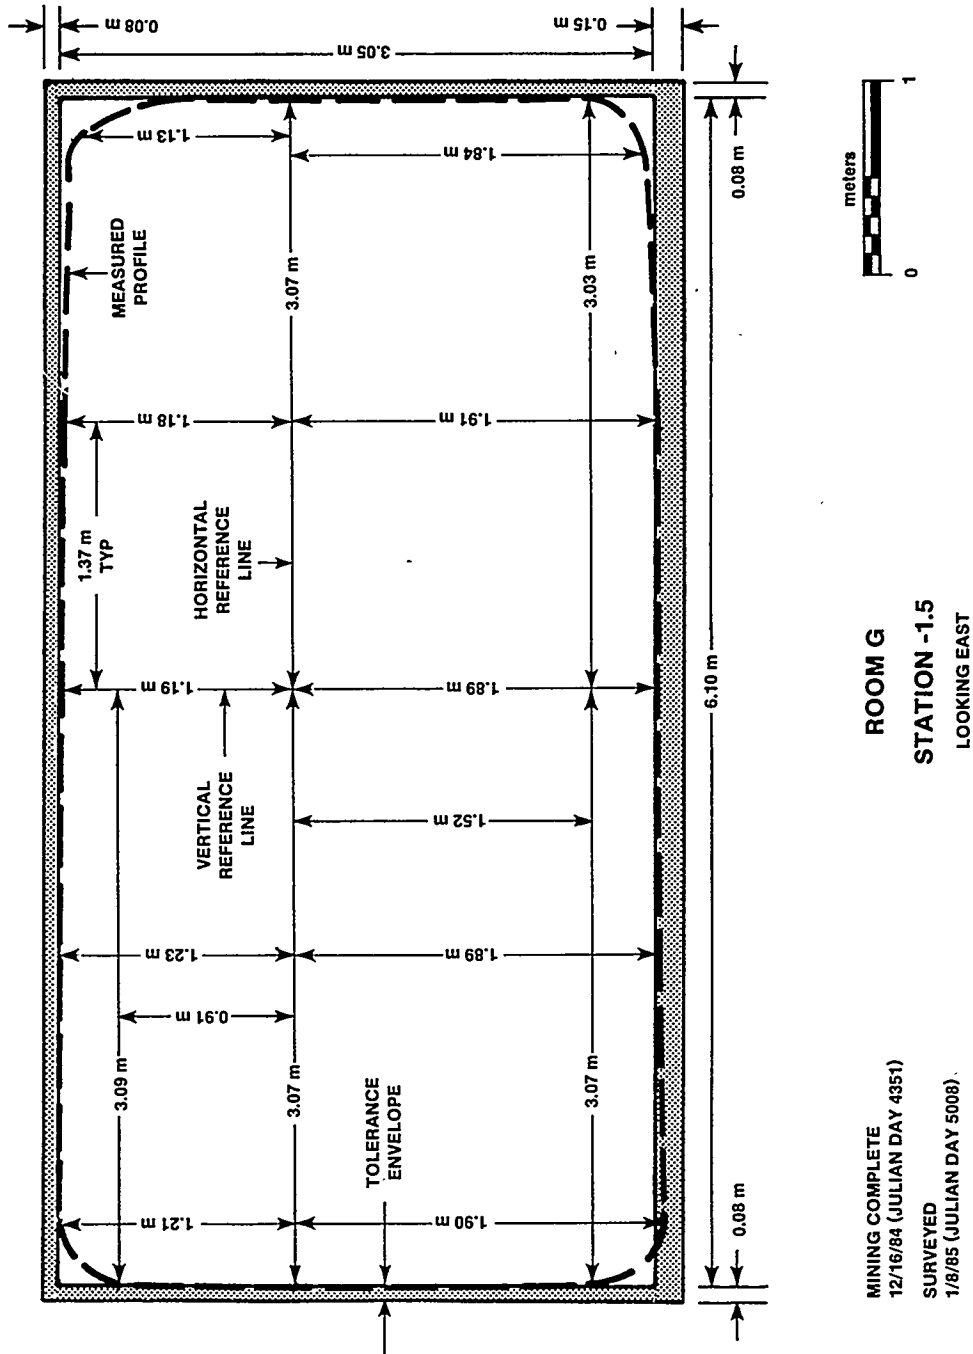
As-Built Cross Section of Station -1.5 m, Room G
